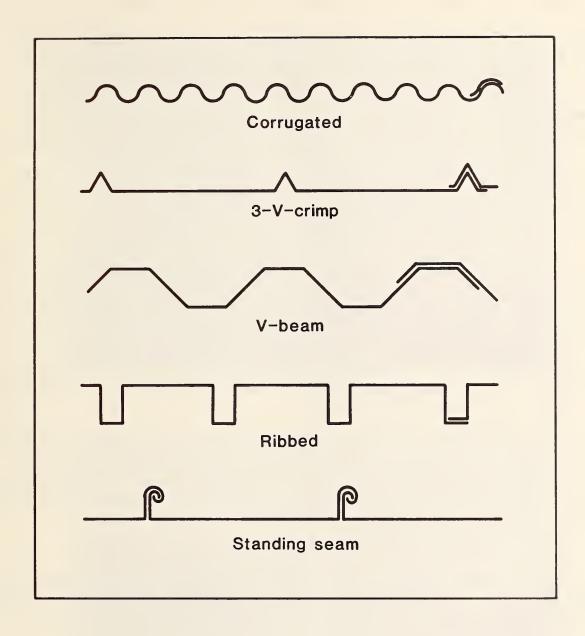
Configurations of typical metal siding and roofing (not to scale)
